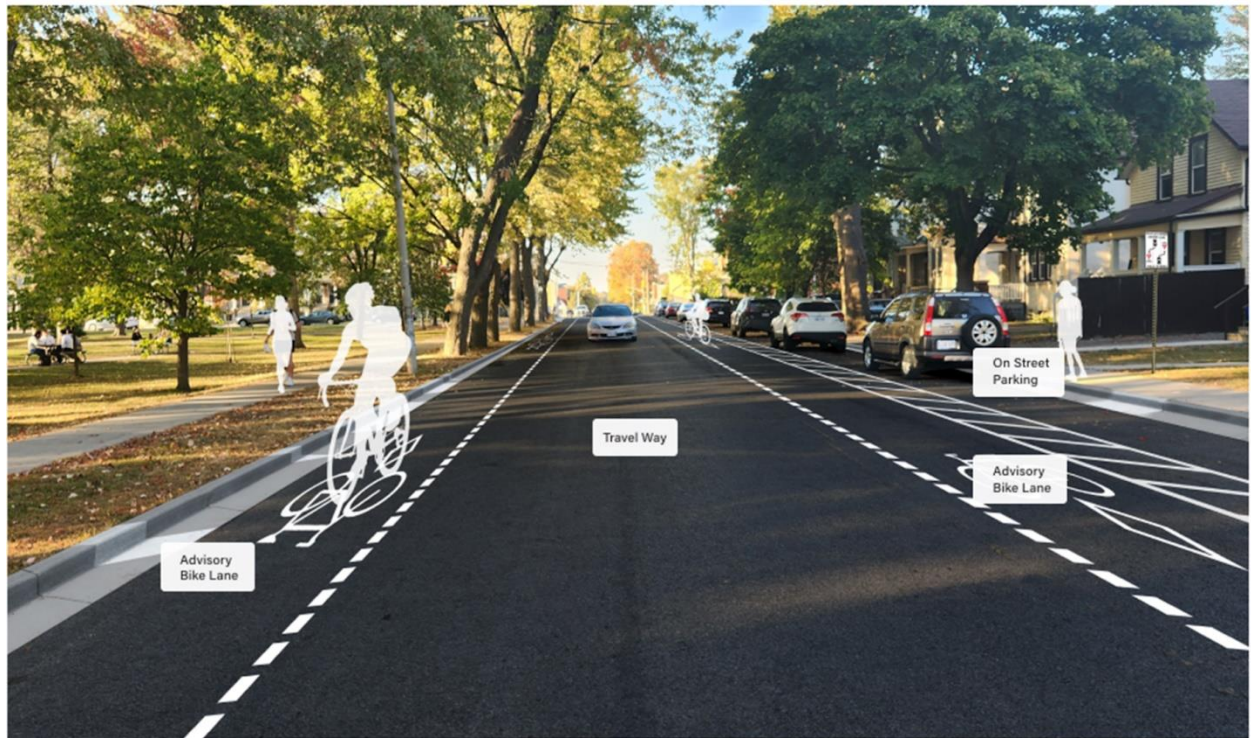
Typical 15 Metre Right-of-way Neighbourhood Bikeway
